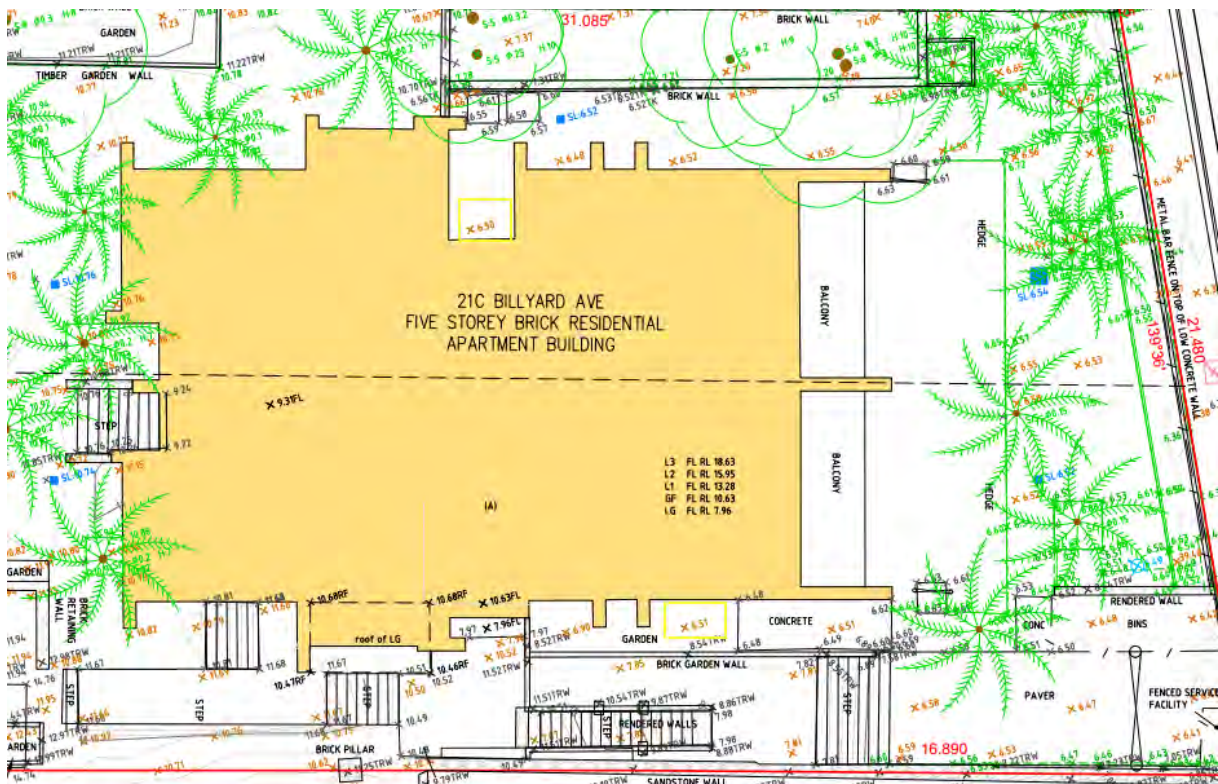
Excerpt of Detail Survey Plan for existing site. The existing ground level below the highest point of the building is outlined in yellow for the Billyard Avenue building.
